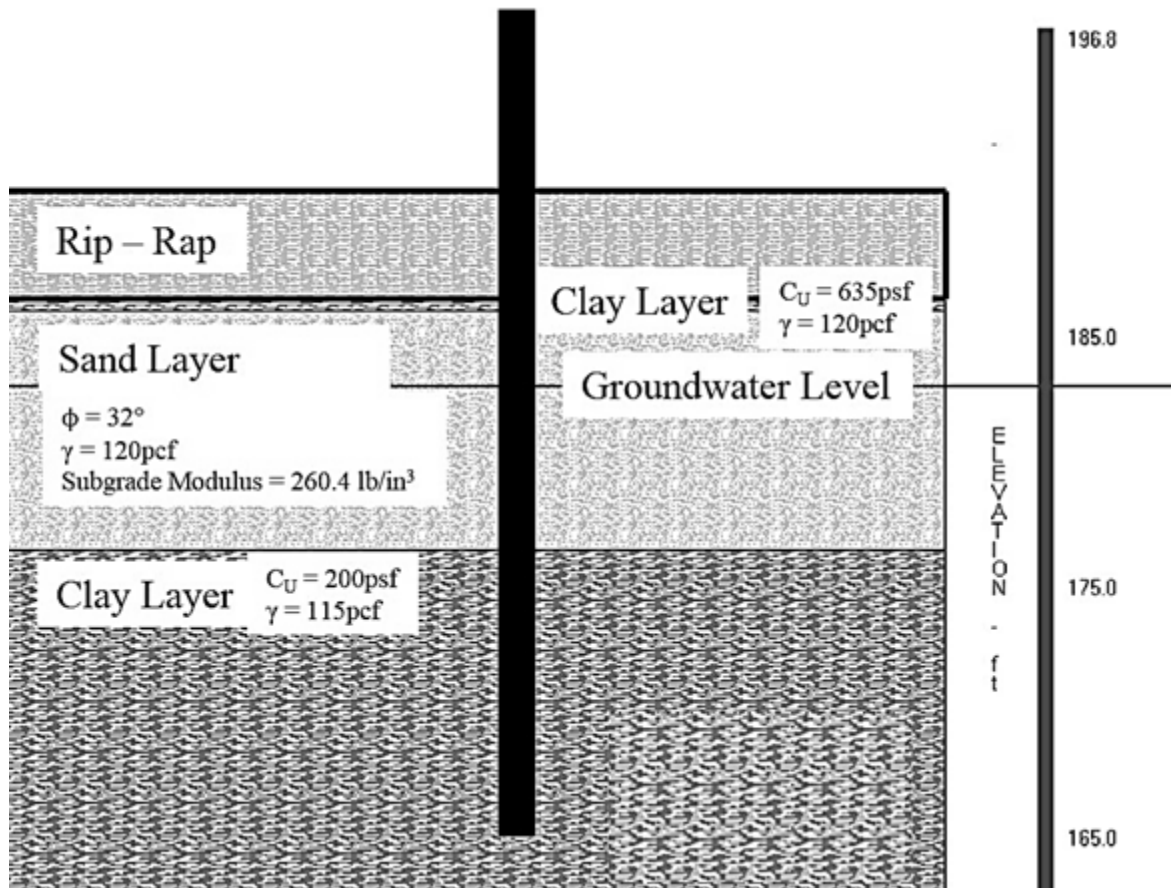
Macon County Road 9 Bridge Soil and Pile Profile (Adapted from FB Multiplier)
